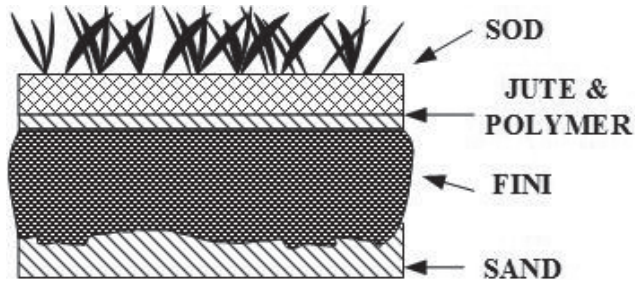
Typical vegetation section (Courtesy of Florida DOT).
